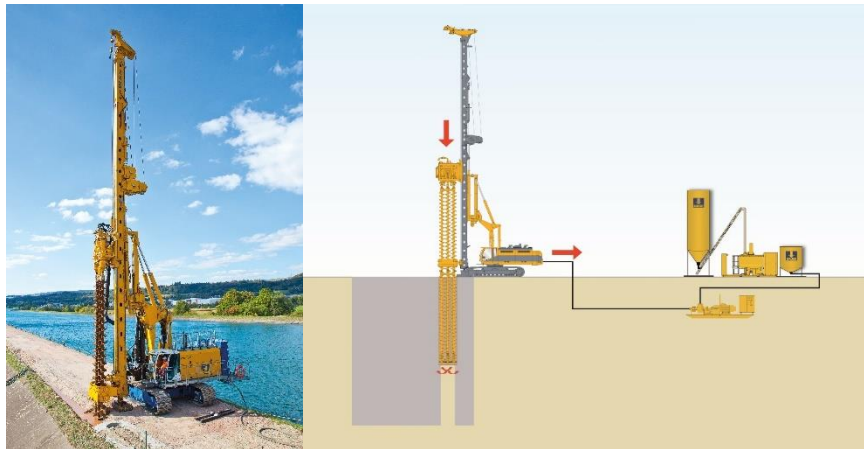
Modern Rig during installation of a MIP cut-off wall (left), and a typical site setup for MIP works (right)
